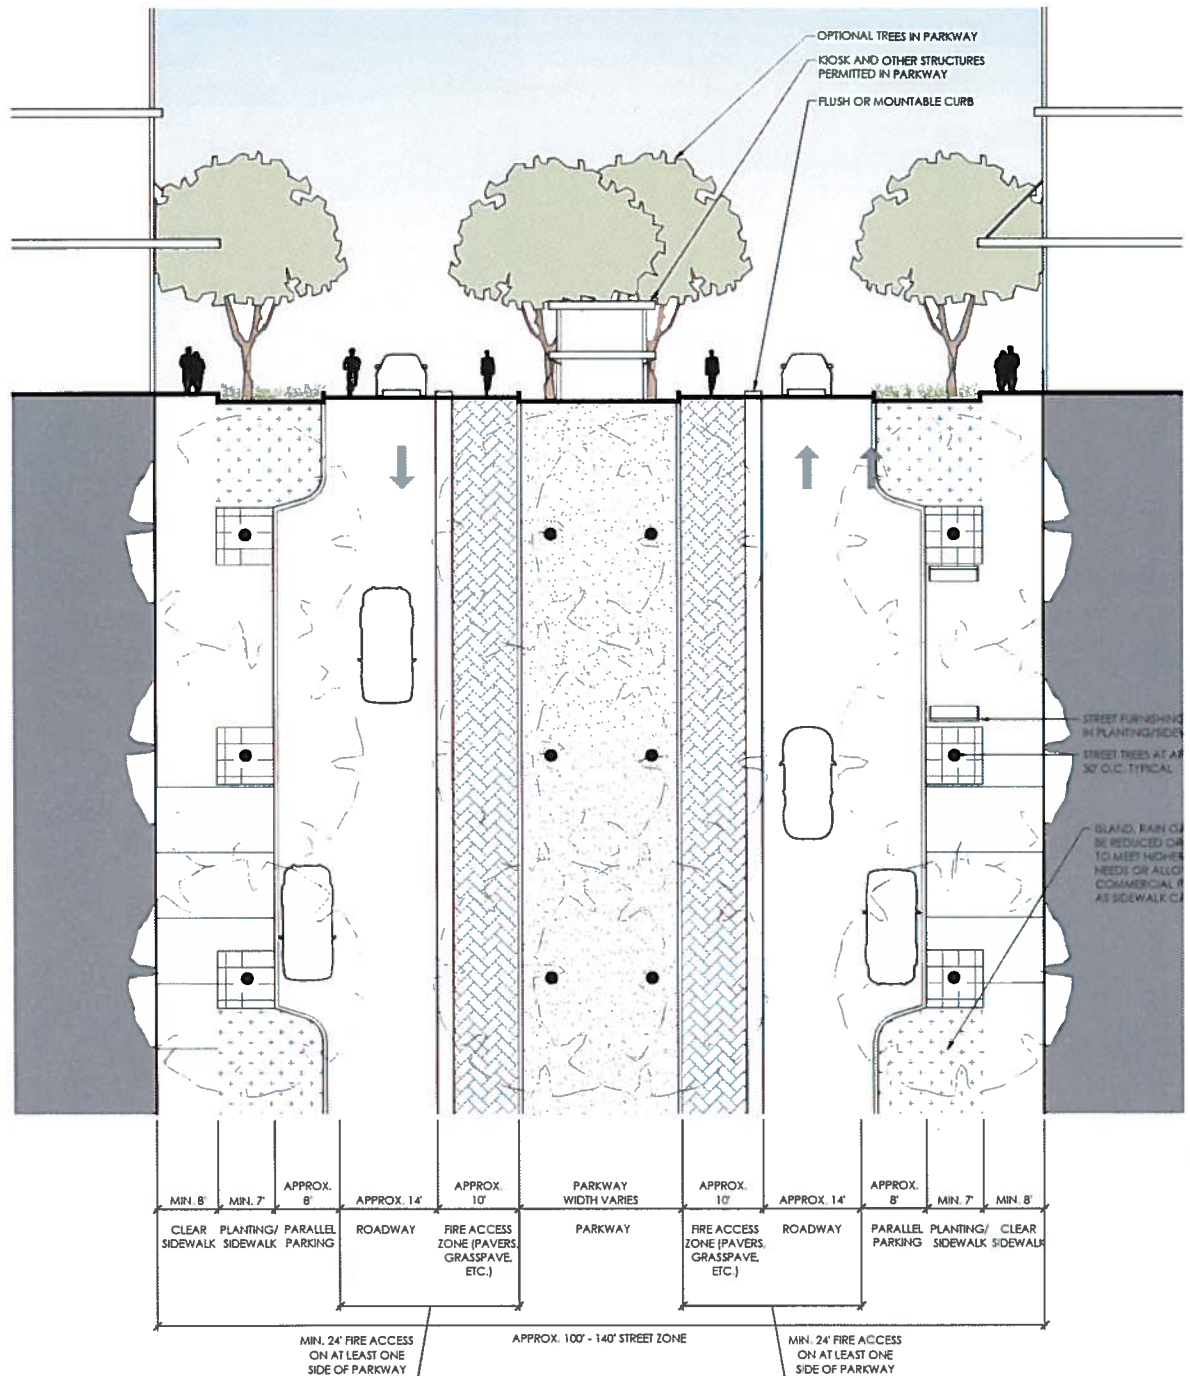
b: Retail Main Street - Parkway Alternative
